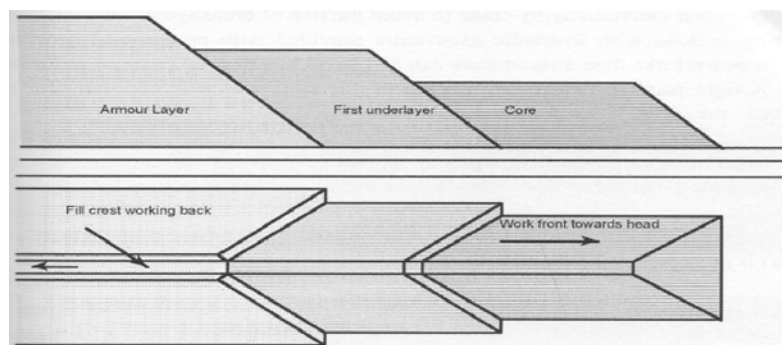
Breakwater under construction work fronts (Verhagen, D'Angremond, & Van Roode, 2012)
